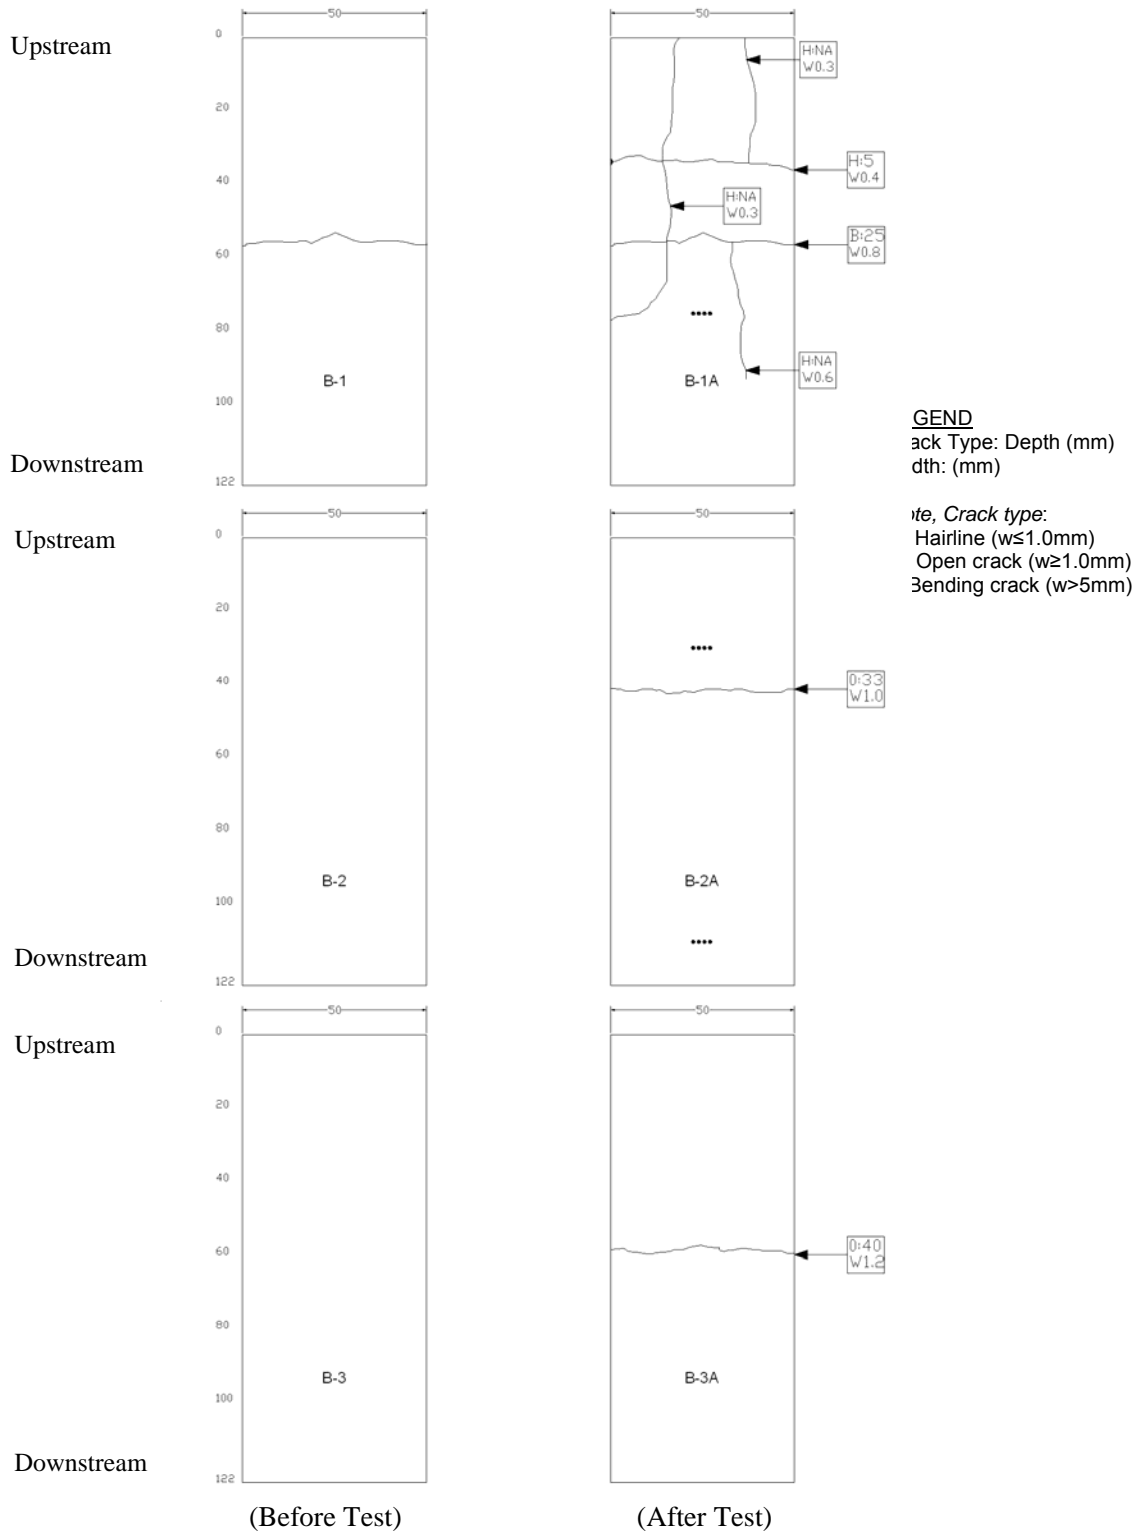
Crack observations-Uncoated concrete slabs B-1, B-2 and B-3
